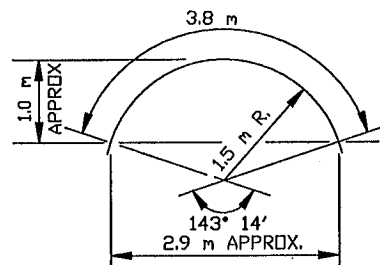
PLATE BEAM NOSE ⑤ (1.5 m RADIUS)
